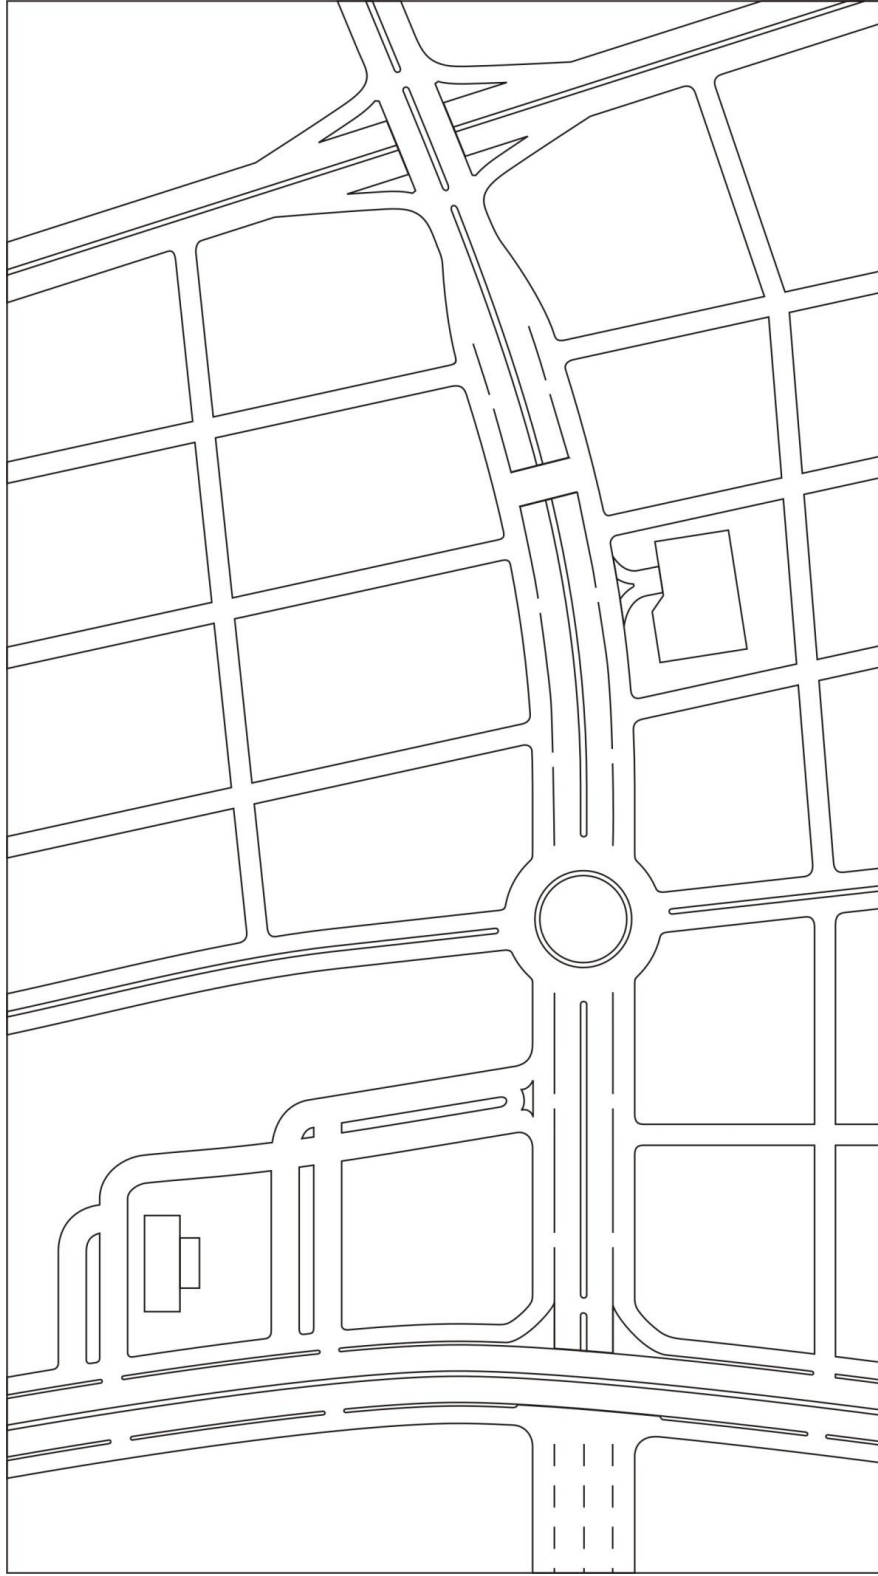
Geometrical design of proposition 2 (tunnel, roundabout & bridge)
